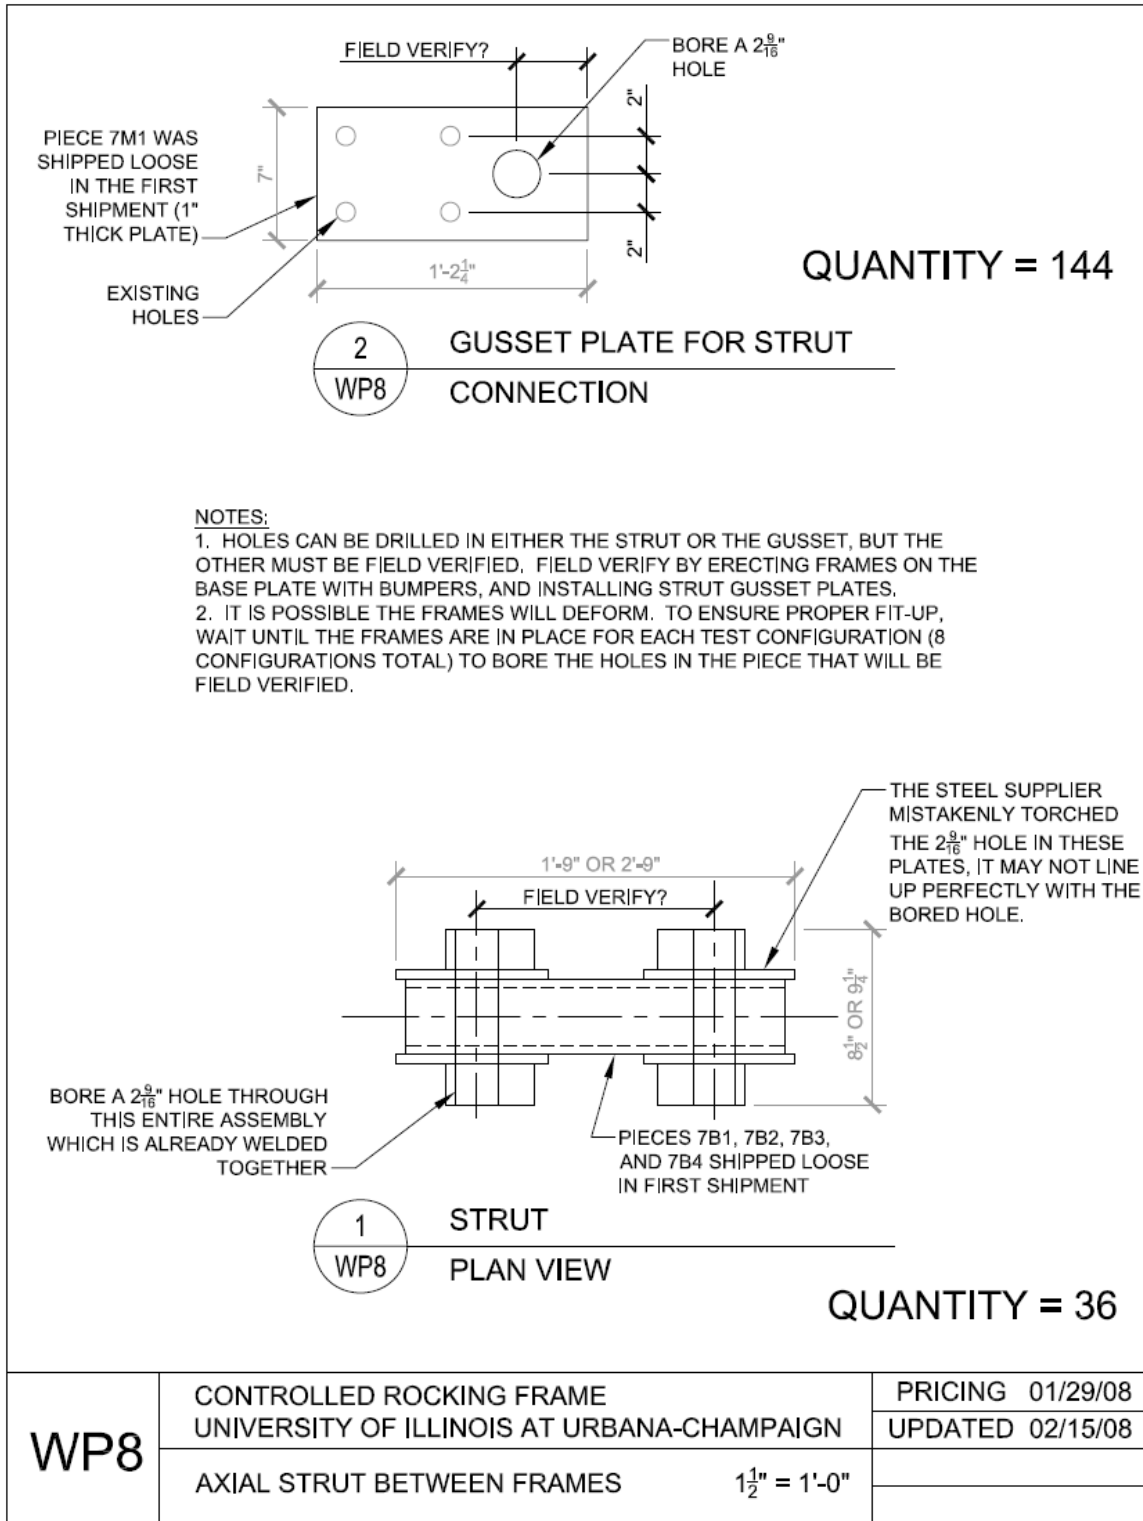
Work Plan Drawing – Axial Strut Between Frames
